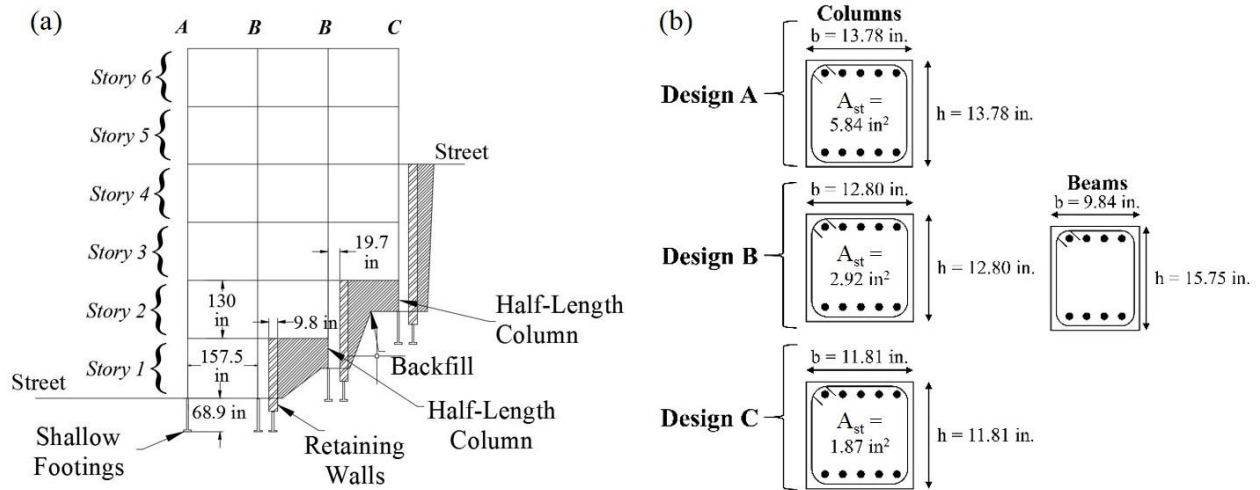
Illustration of control building showing (a) elevation view of building configuration and (b) column and beam dimensions and detailing for case study building (dimensions not to scale).
